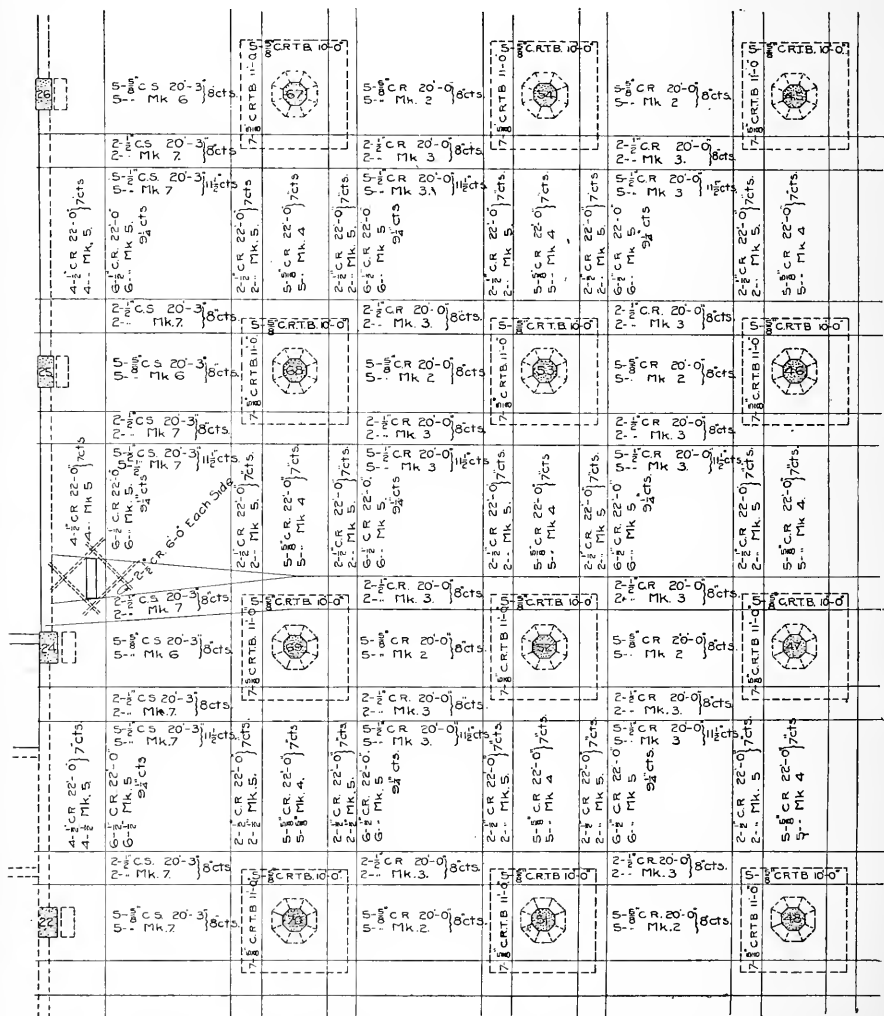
DISTRIBUTION OF REINFORCEMENT FOR TEST FLOOR OF SHREDDED WHEAT FACTORY.
